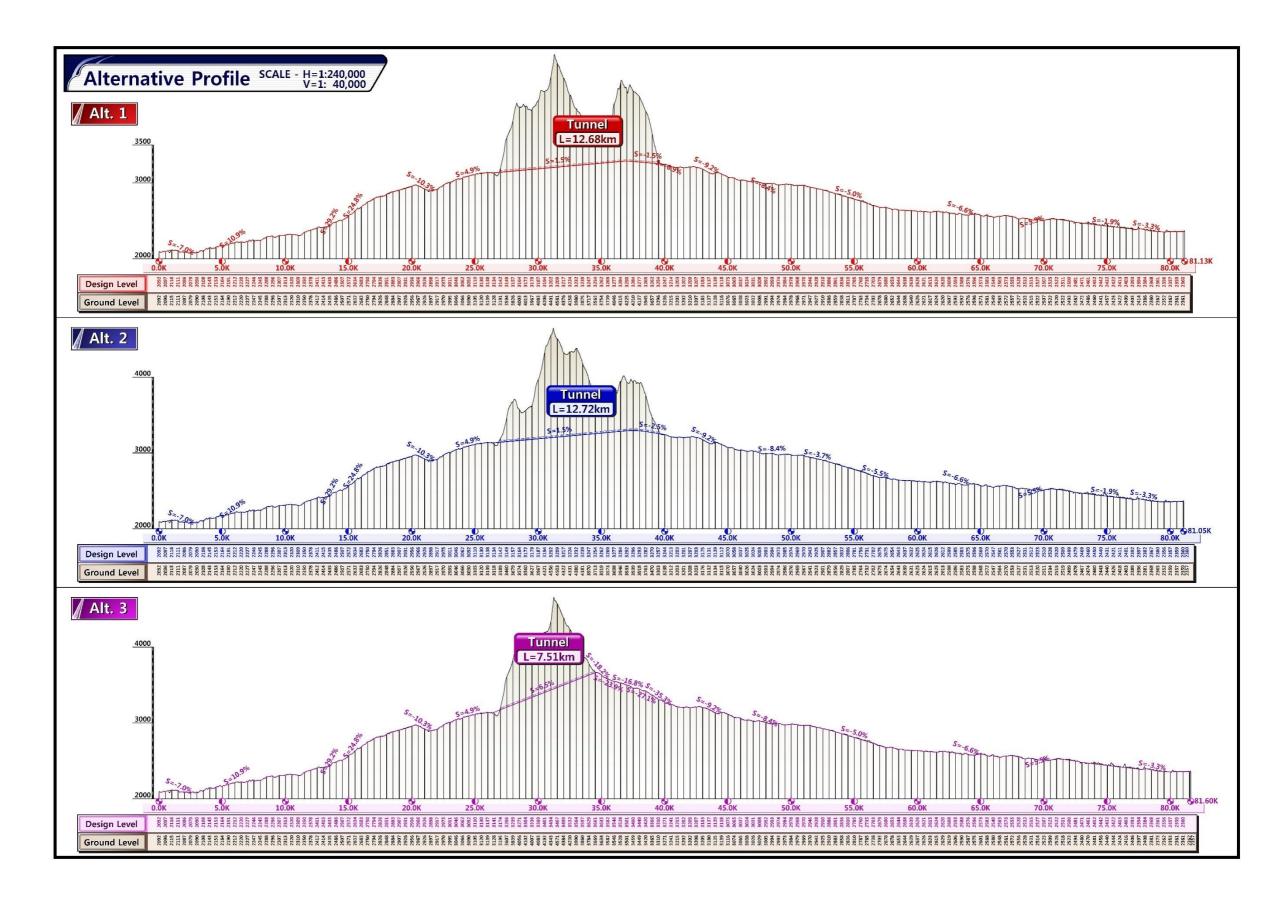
Alignment Drawings Options of Proposed Tunnel Project and Access Road
